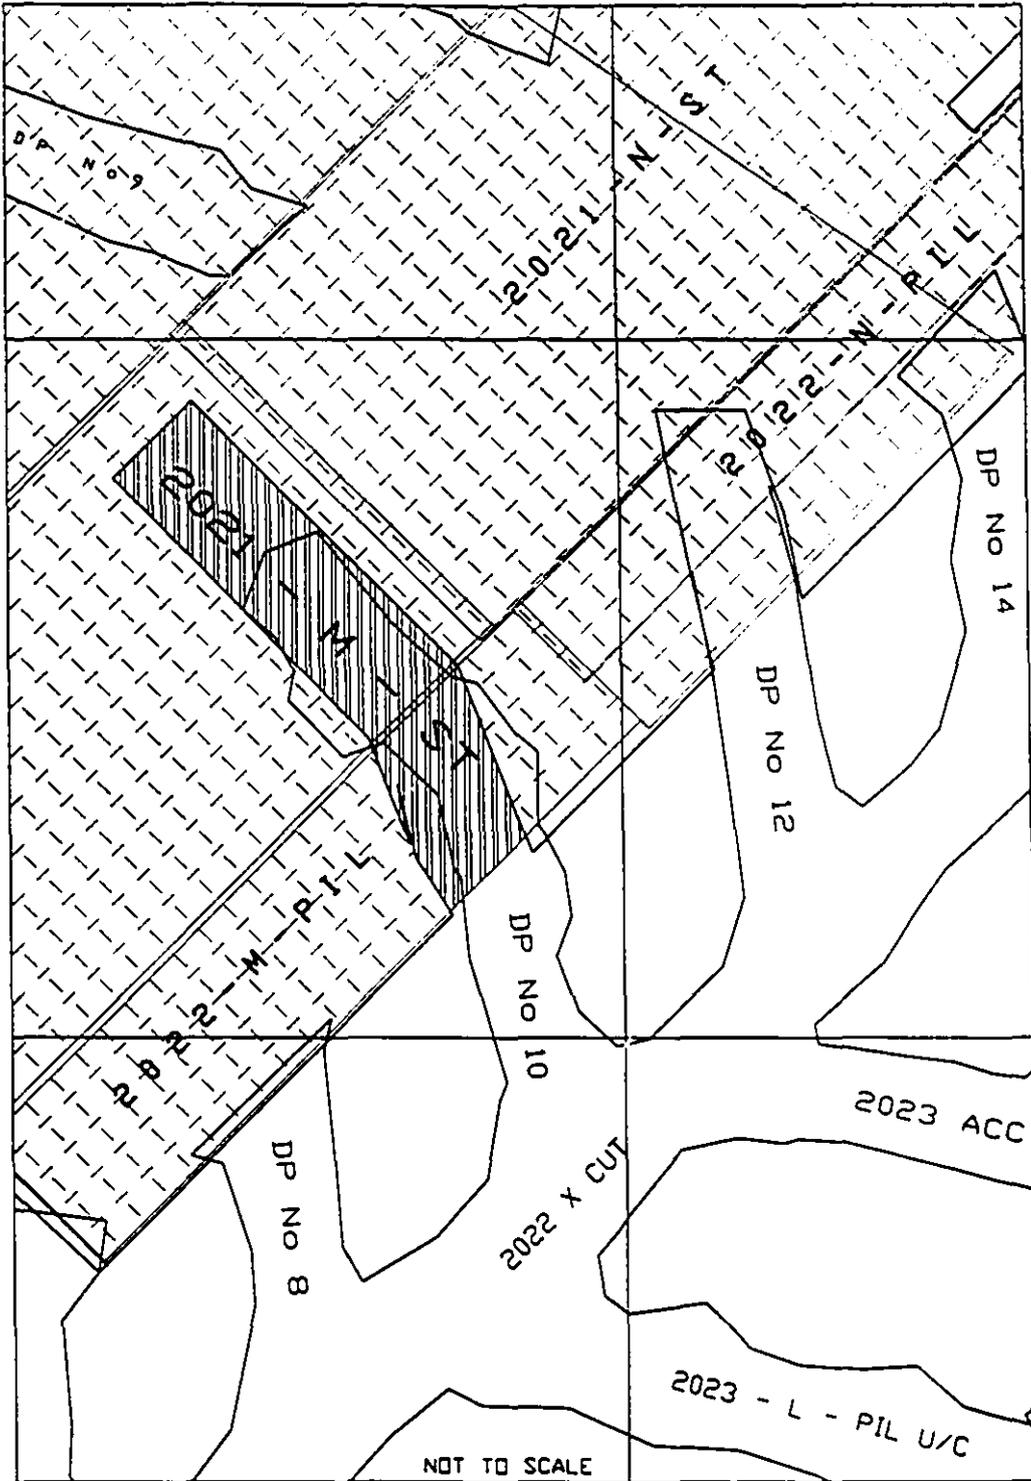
LEVEL PLAN SHOWING 2021-M-ST ROADHEADER DRIFT
